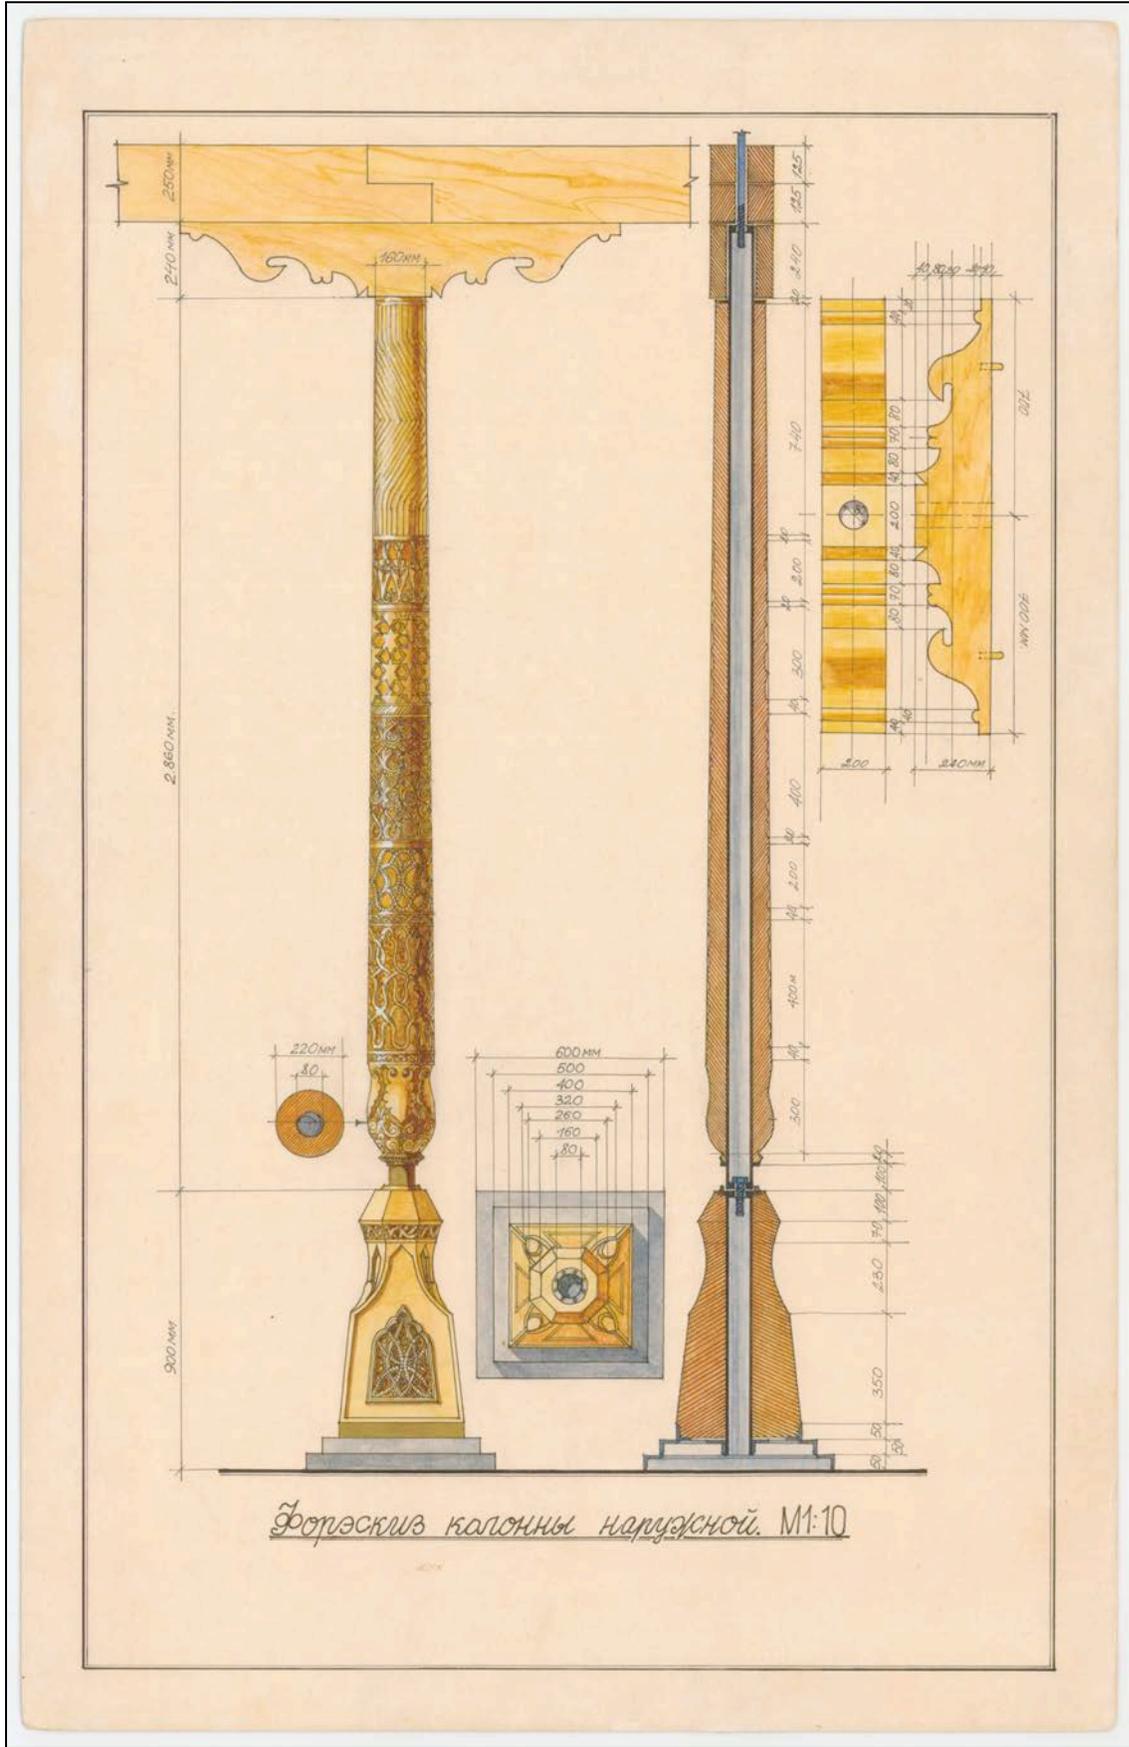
Boulder-Dushanbe Teahouse: Original Column #1 Drawing, Lado Shanidze, 1988
